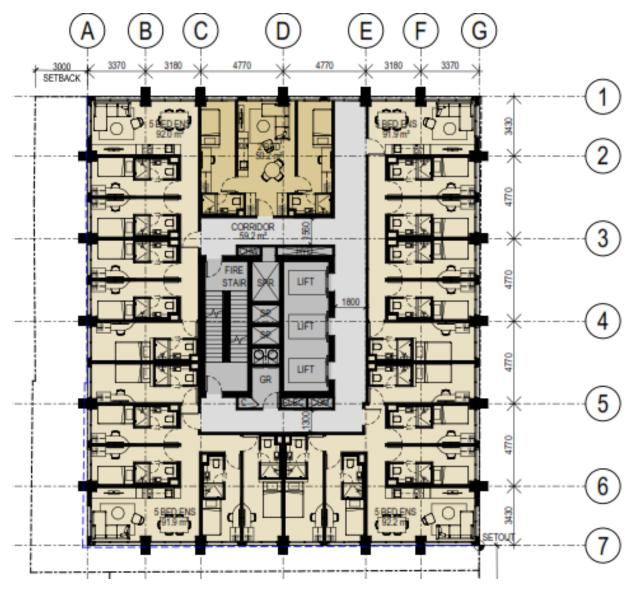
Proposed typical floor plan for upper levels (extracted from Rothelowman's drawings)
